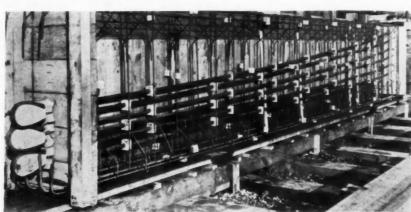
Inflated rubber tubes forming cores for prestressing cables
